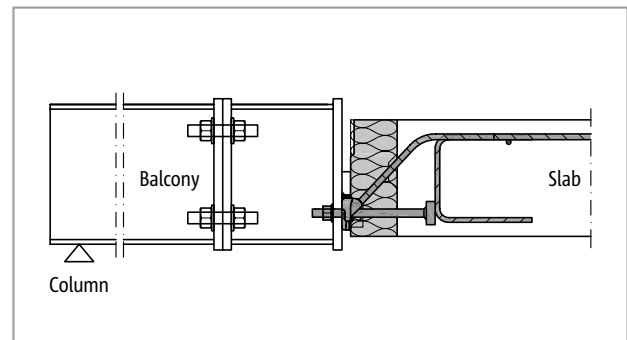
Schöck Isokorb® T type SQ: Steel stub adjuster between the Isokorb® and the balcony supports flexible construction workflows
